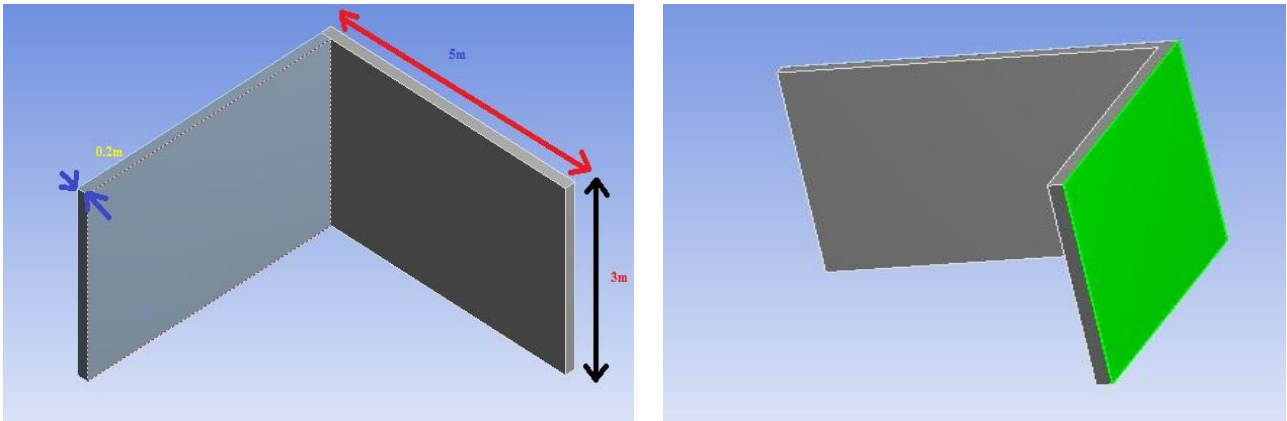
Geometry of L-shape concrete wall without and with steel plate cladding
